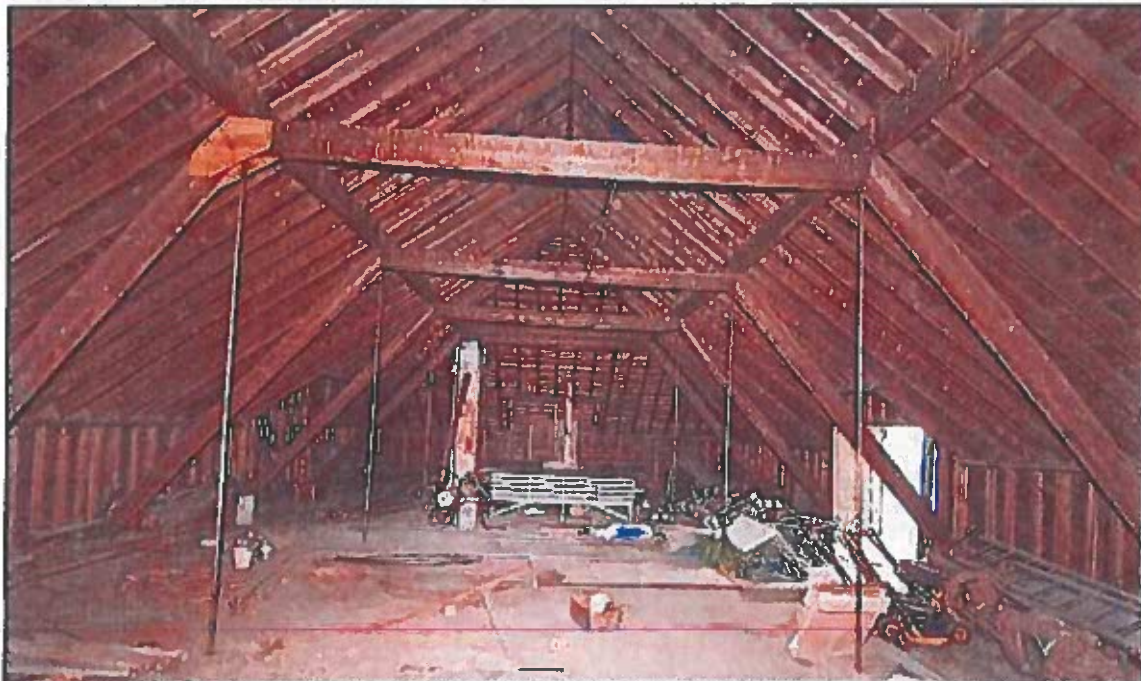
Interior of main barn loft floor showing queen rood roof trusses and exposed framing and sheathing. Stored items should be sorted items that are obsolete and of no historic value to the cemetery removed. There is considerable dust and fiber debris on the floor (especially at the side walls) that is a potential fire hazard and should be vacuumed out.
